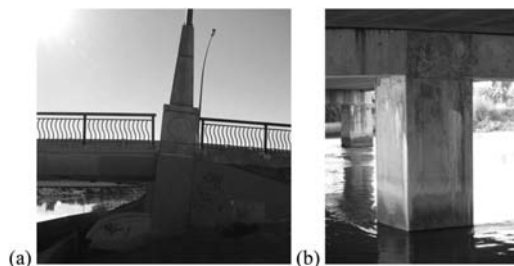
(a) Backwards rotation of the abutments of Anzac Drive Bridge [Photo by A. Palermo]; (b) Plastic hinging at the pier caps of Anzac Drive Bridge [Photo by E. Camnasio].
